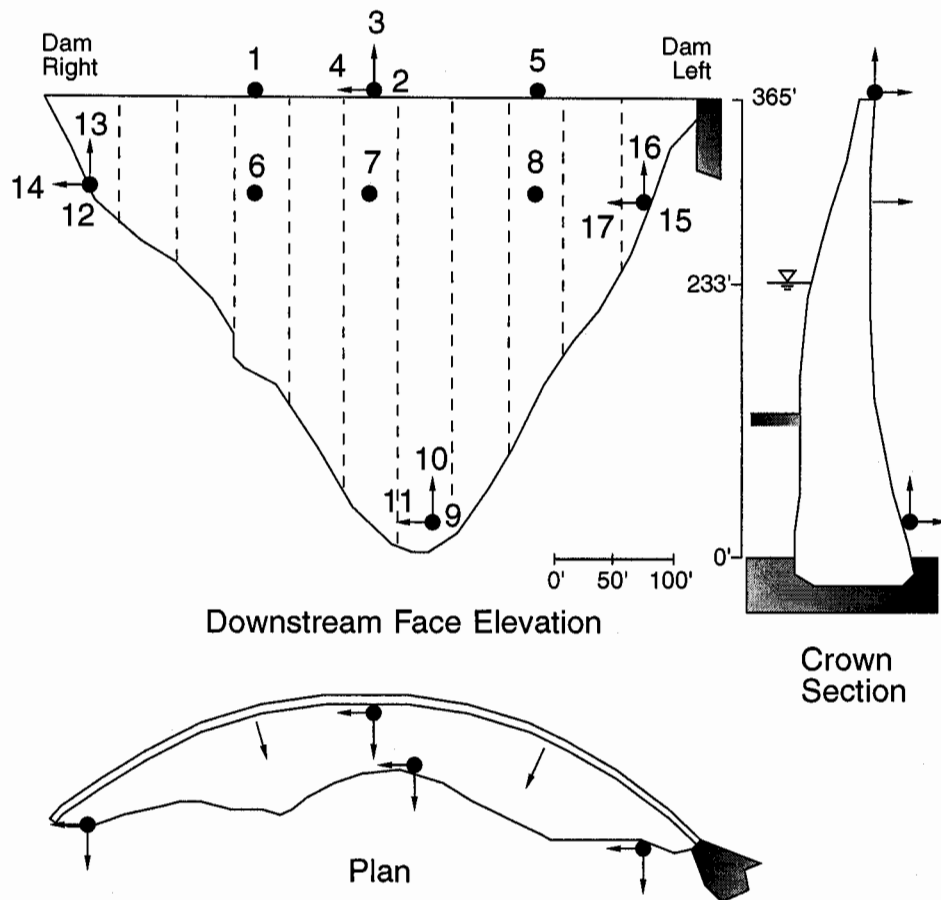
Instrumentation Plan for Pacoima Dam (CSMIP, 1994)
